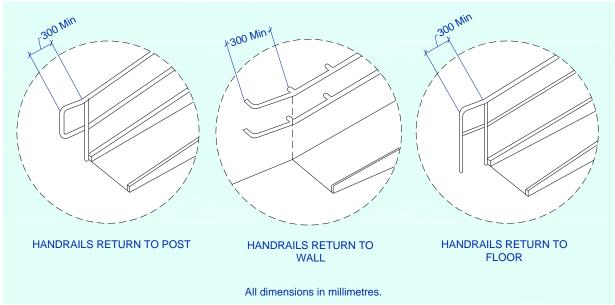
Typical handrail extensions (Source: NBC, 2016)
